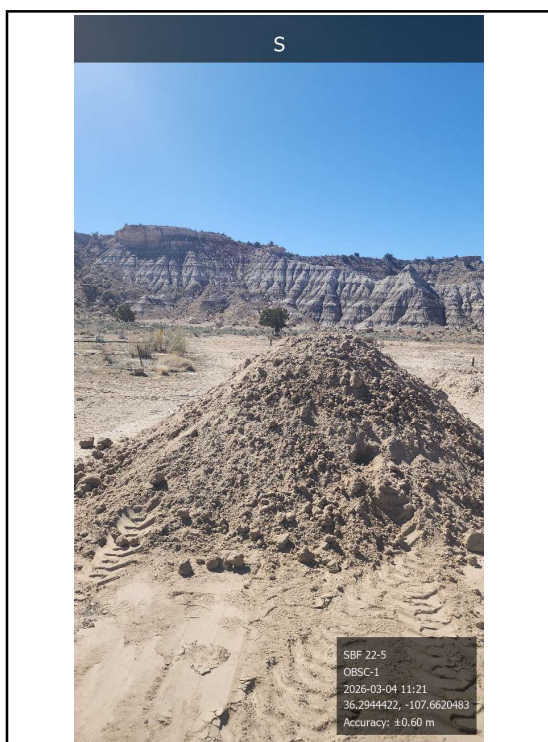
Overburden pile harvested from the upper 3.5 feet of the east wall. One 5-point composite sample was collected from approximately 4 cubic yards.
